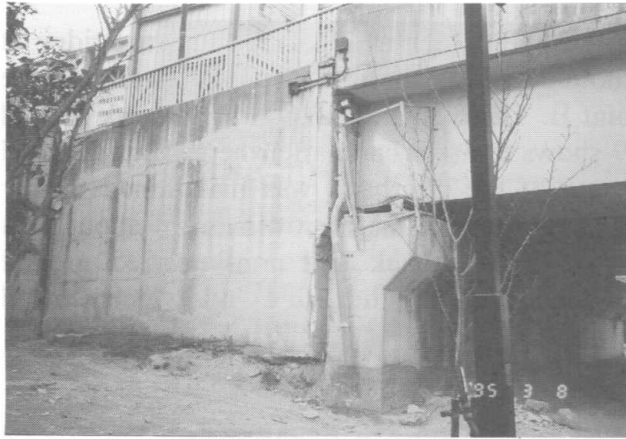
Abutment of Miyagawa Bridge moved and inclined due to ground movement toward the river (left) (A in Figure 18)
